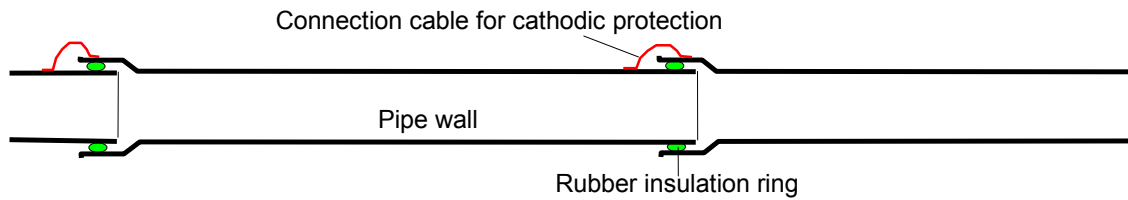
Sketch of a cast iron pipeline with joints insulated with rubber rings and where the pipes are connected to each other with cables.
